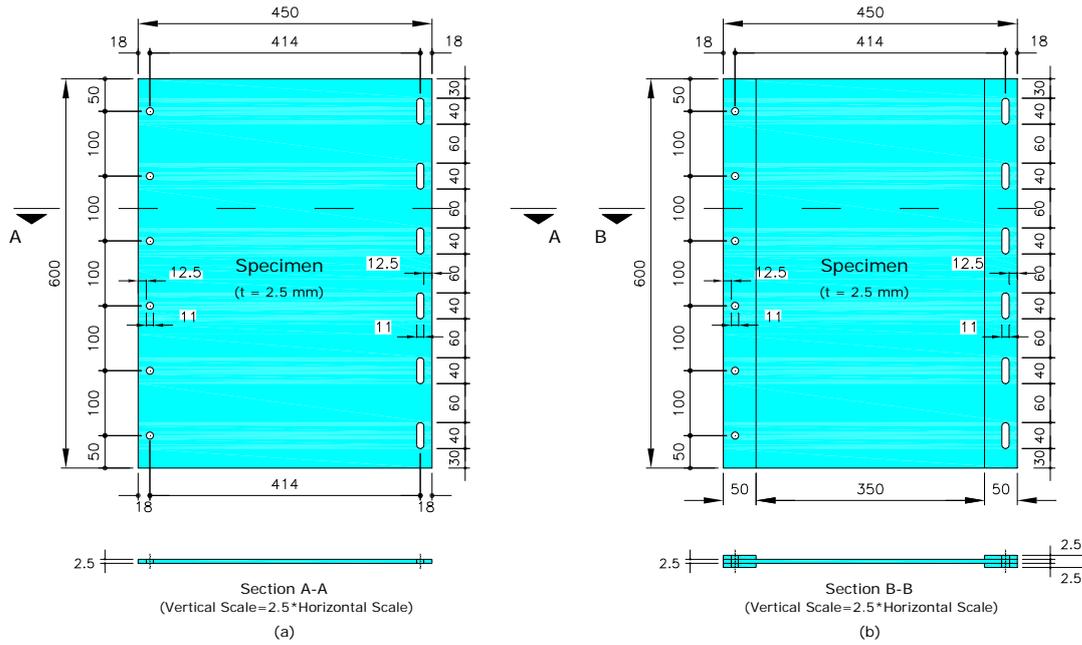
Dimensions of the specimens and the details and locations of the slots and bolt holes used in them. a) Specimen of Type 2 (see Table 1), and b) specimen of Type 3 with BSPs.
